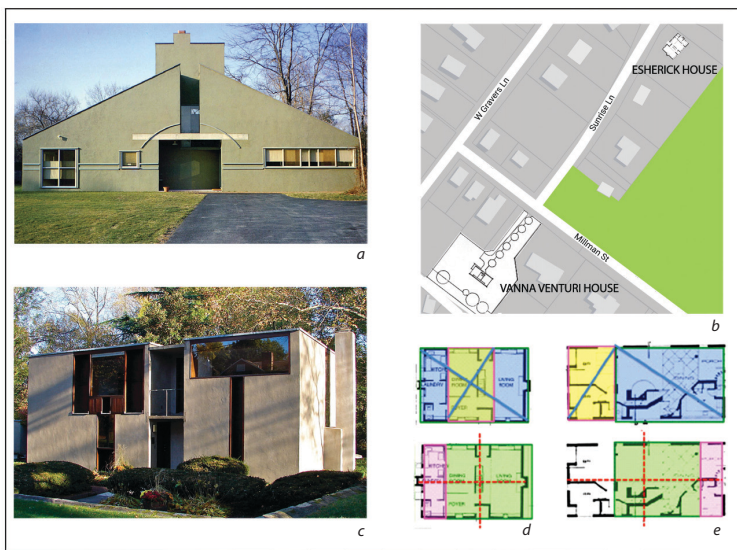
a. Robert Venturi, Vanna Venturi House, street elevation; b. Site plan, Vanna Venturi & Escherick Houses; c. Louis Kahn, Escherick House, street elevation; d-e. Proportions in the Escherick House compared with proportions in the Vanna Venturi House.
